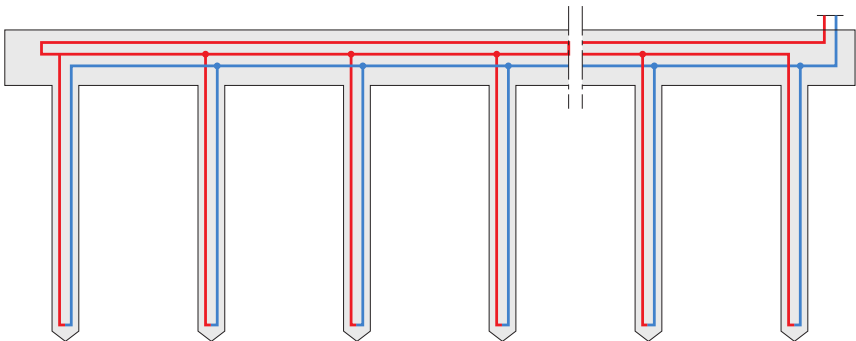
Schematic diagramm of thermoactive foundations. Coils are embedded within foundaton piles.
